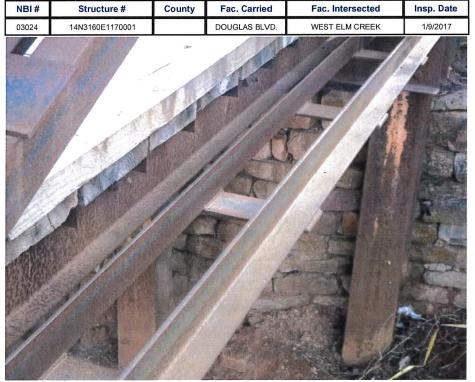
Looking north at the stringer 5 bottom flange connection to the north abutment pile cap. Note: Up to 1/4-inch loss to bottom flange.
